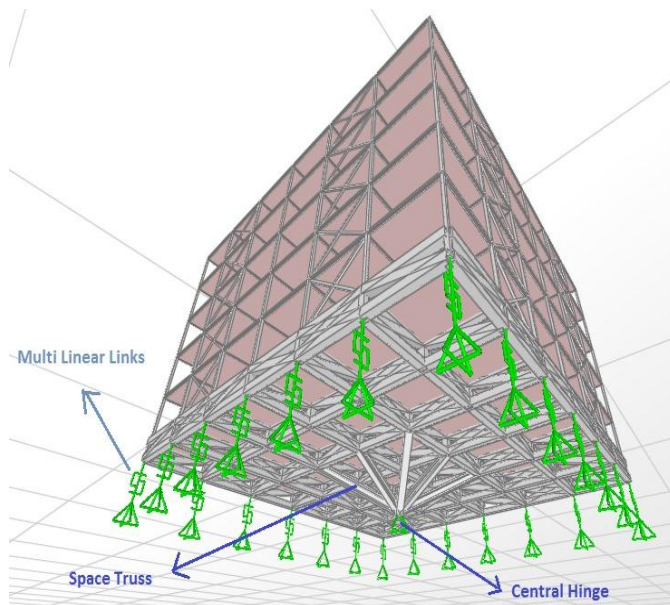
The 3-D view of the rocking building and the grid of strong orthogonal girder and its supporting space truss
